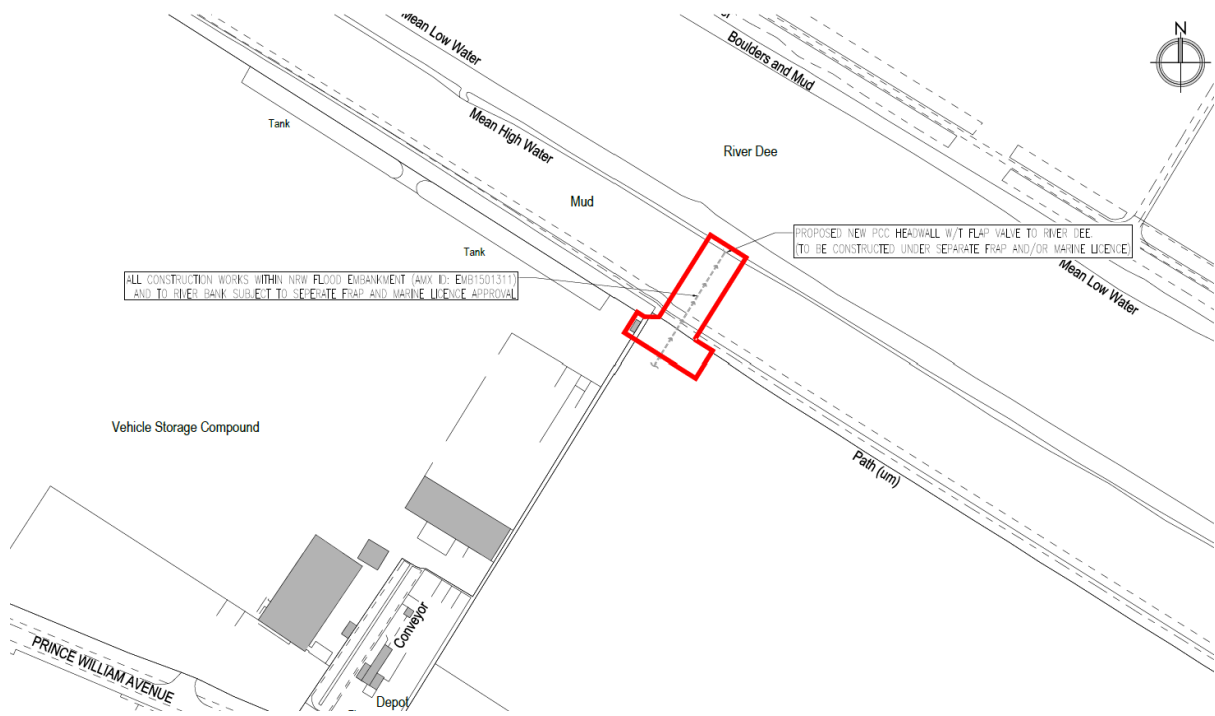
View of Proposed Location of New Drainage Outfall Pipe Beneath Existing Flood Bund
